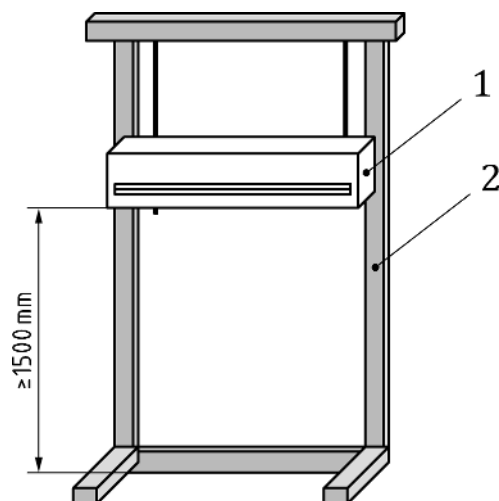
Example of installation low wall unit mounted on a frame, with the back plate
